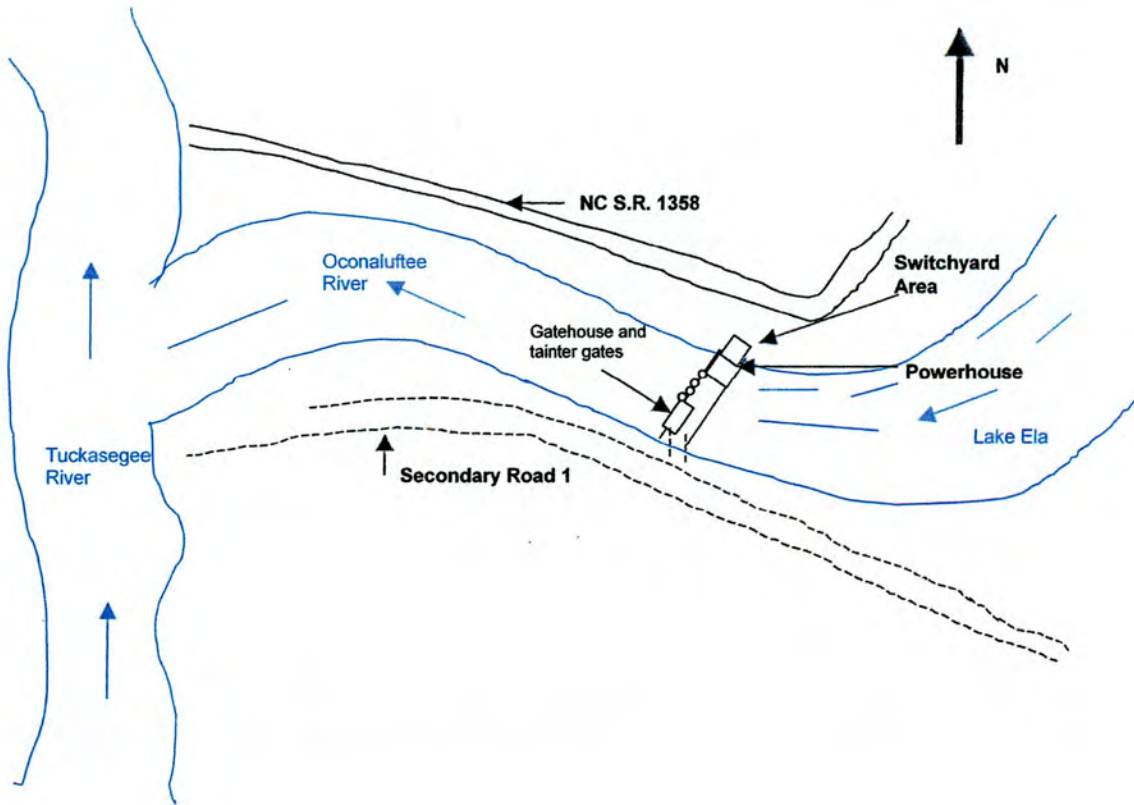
Bryson Powerhouse and Dam Site Plan.
